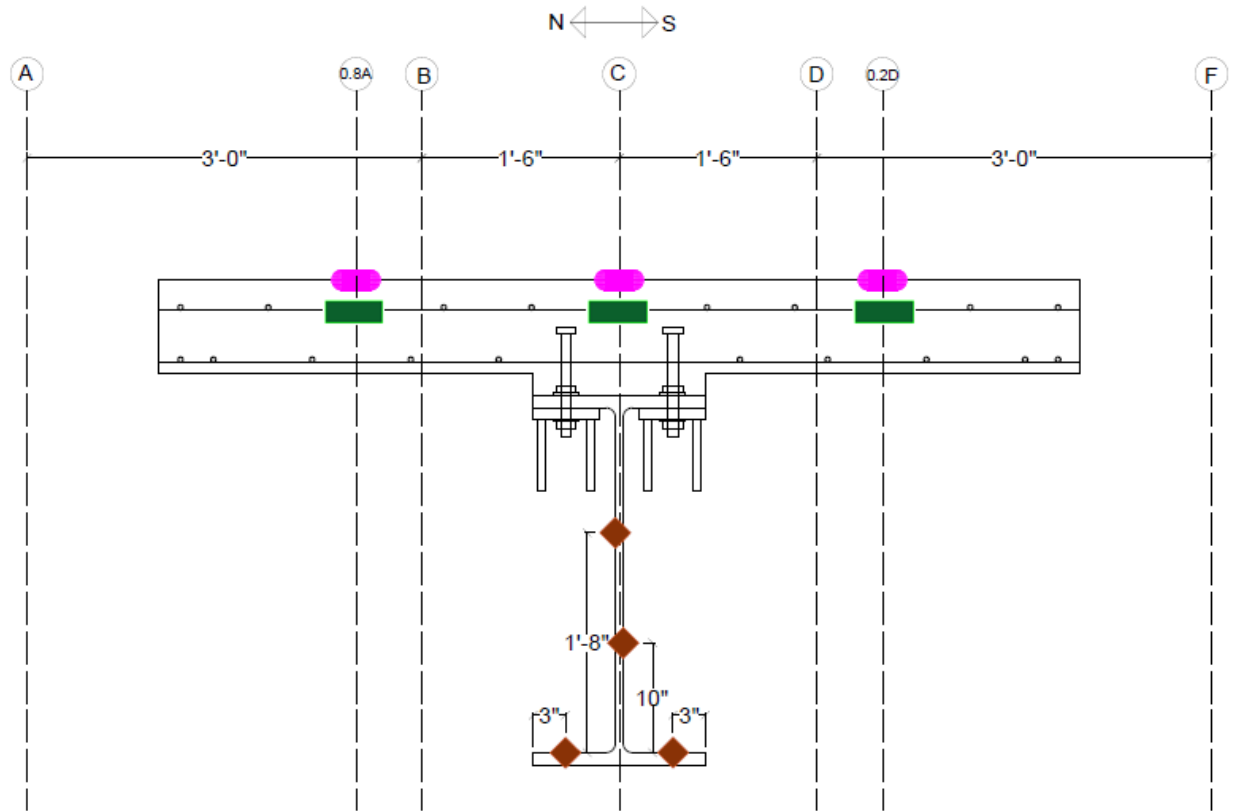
Concept C Instrumentation Plan (Section View at E1).
